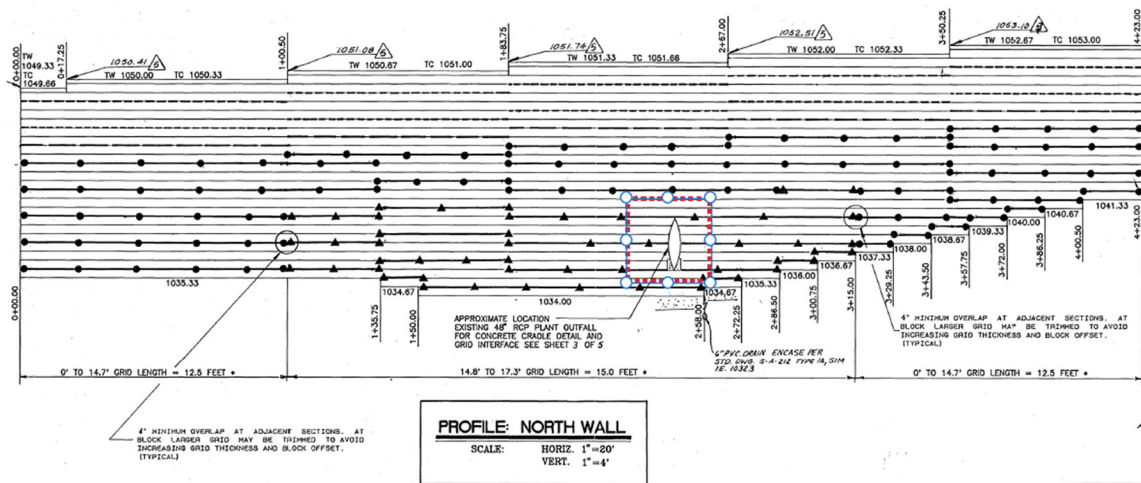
Historic as-built showing approximate penetration of MSE wall for 48-inch outfall pipe.
